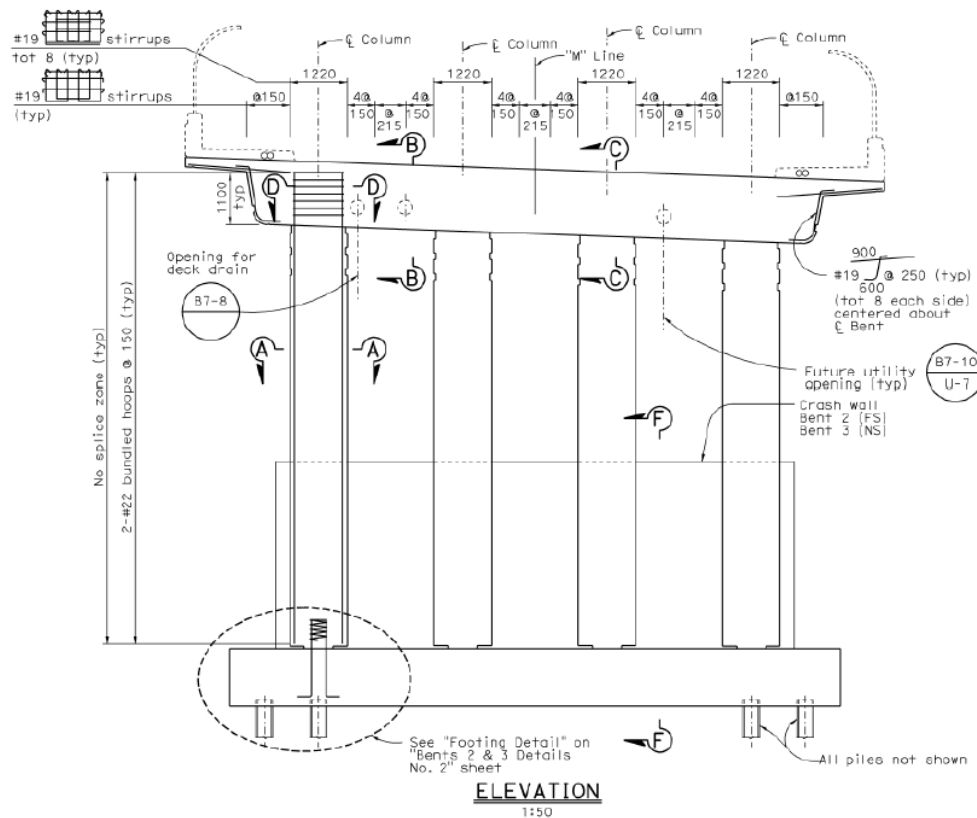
Elevation view of a typical bent of the MAOC bridge (source: Caltrans structural drawings).
